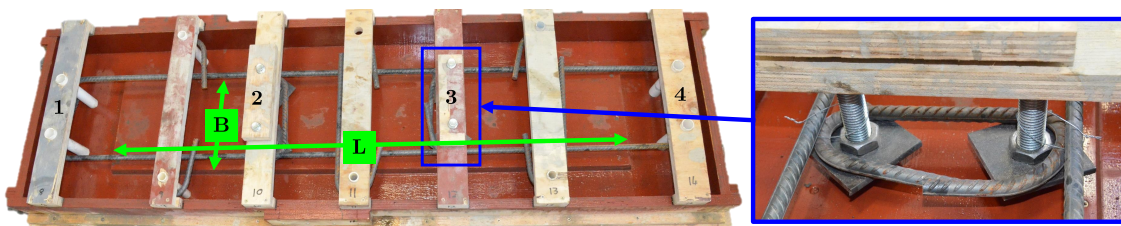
Wooden beam moulds with bolts and reinforcing steel used for top and bottom concrete beams.
